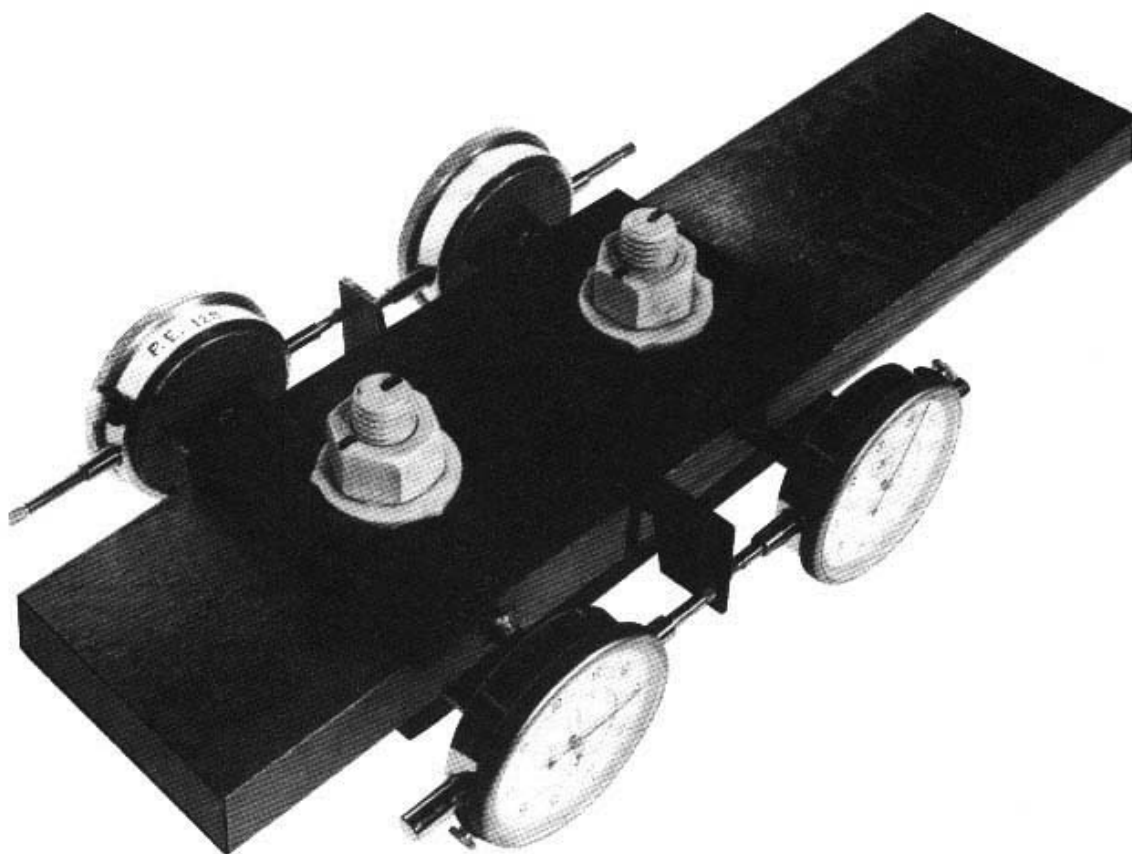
TYPICALLY INSTRUMENTED TEST ASSEMBLY
